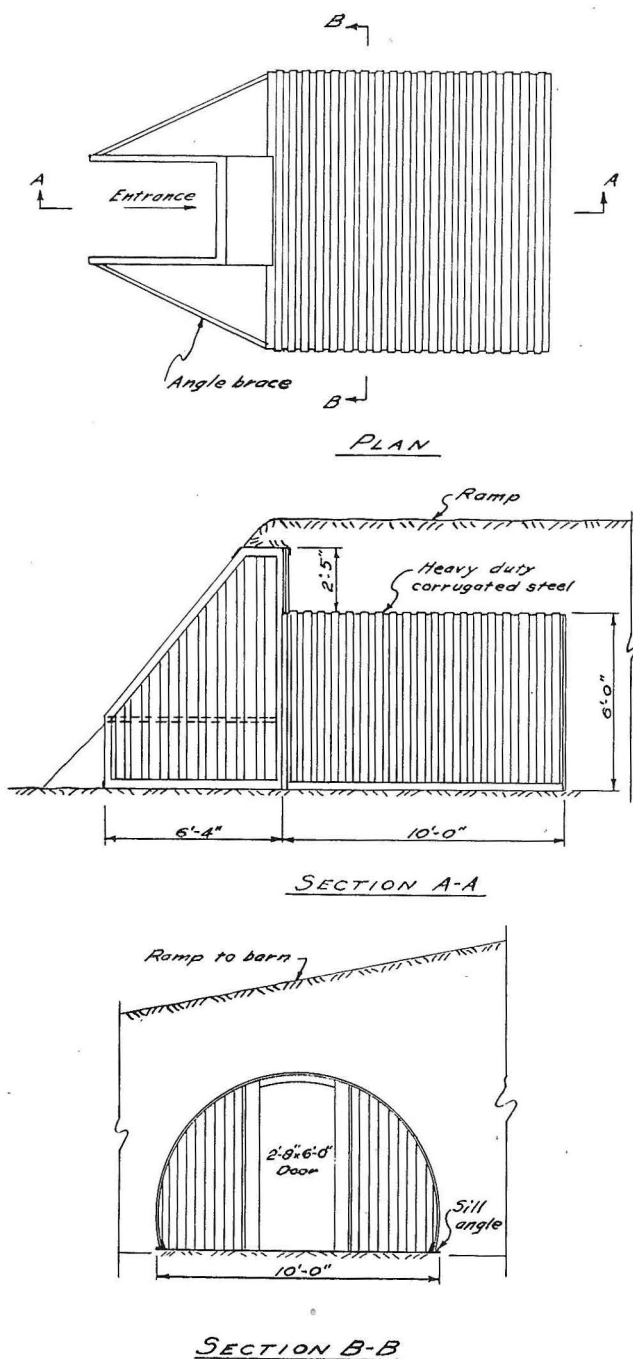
Plan and arrangement of an all-steel underground storage.
